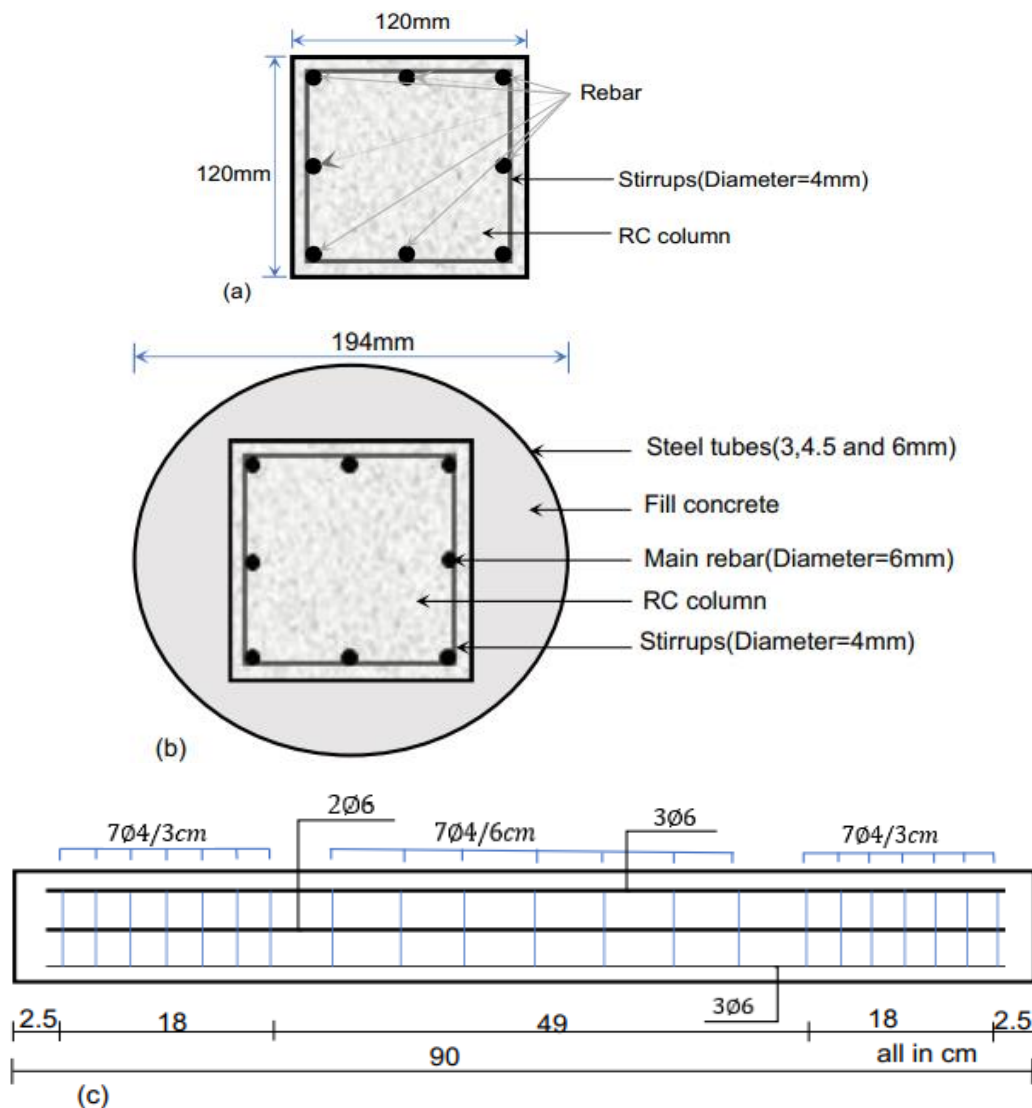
Schematic view of the RC column (a), Strengthened column by Steel tubes(b) and the reinforcement arrangement (c)
